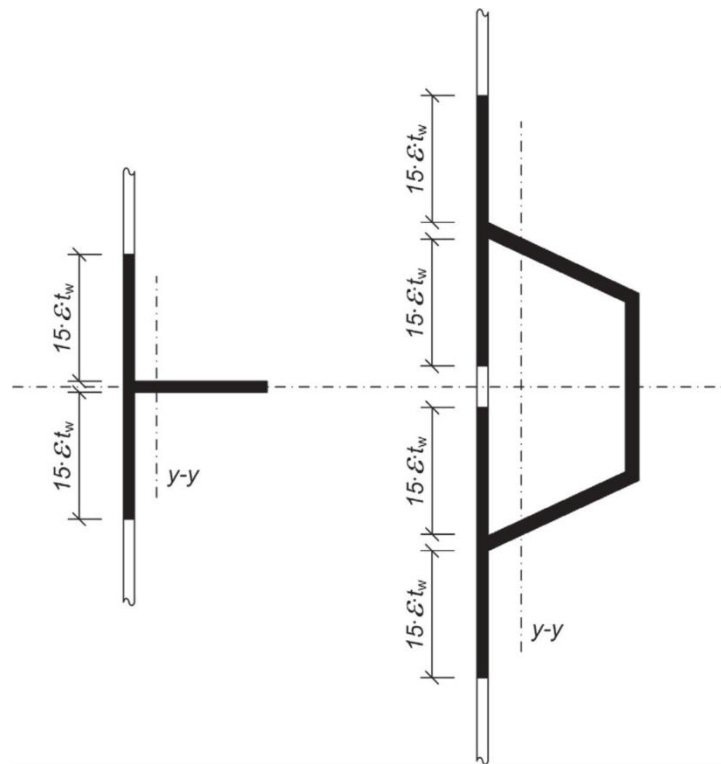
The effective cross-section of an open section longitudinal stiffener (left) and a closed section longitudinal stiffener (right), according to EN1993-1-5 [7, p. 26].
